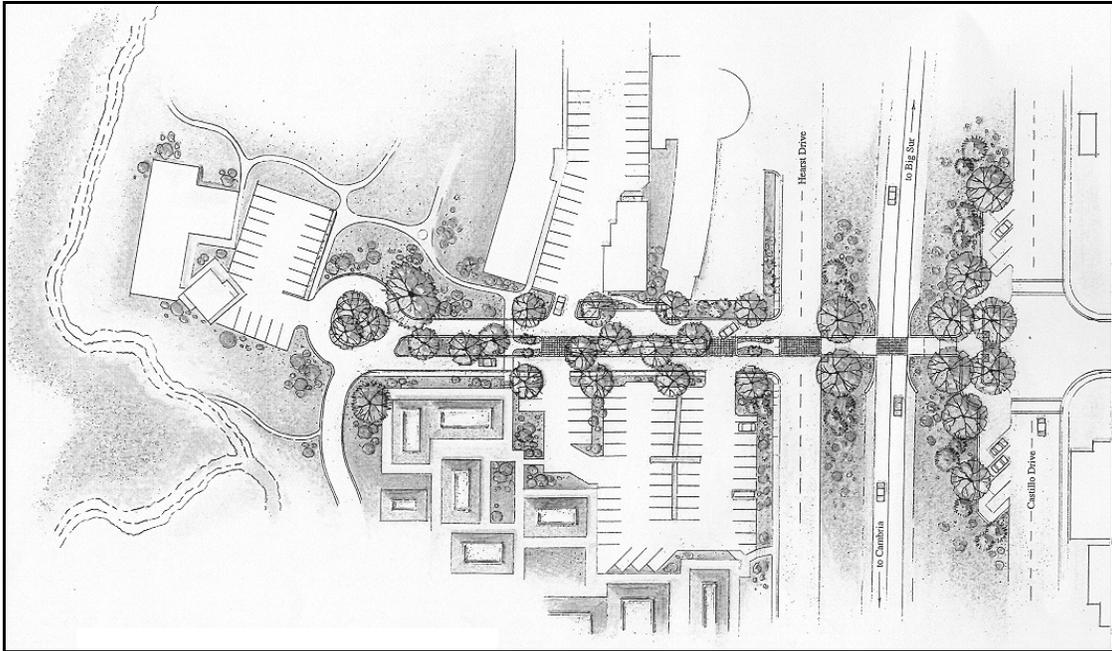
San Simeon Acres - Highway One Crossing Plan
